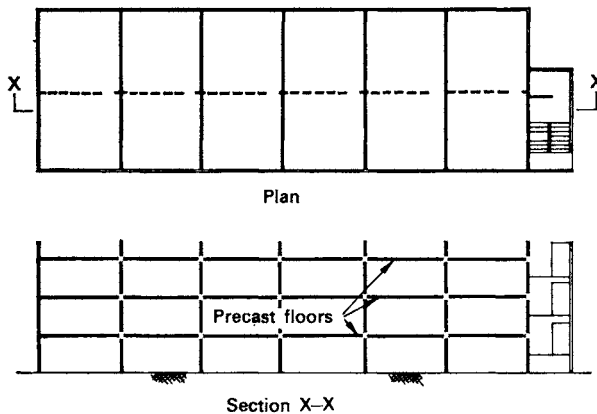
Example of brickwork construction which could lead to a progressive collapse.
